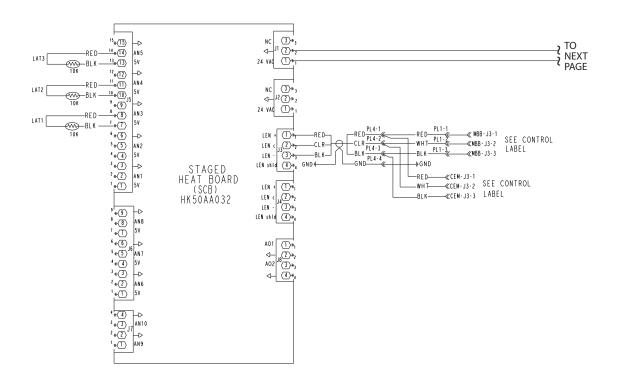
Typical Staged Gas Heat Wiring Schematic (Size 051 and 060 Units Shown)
